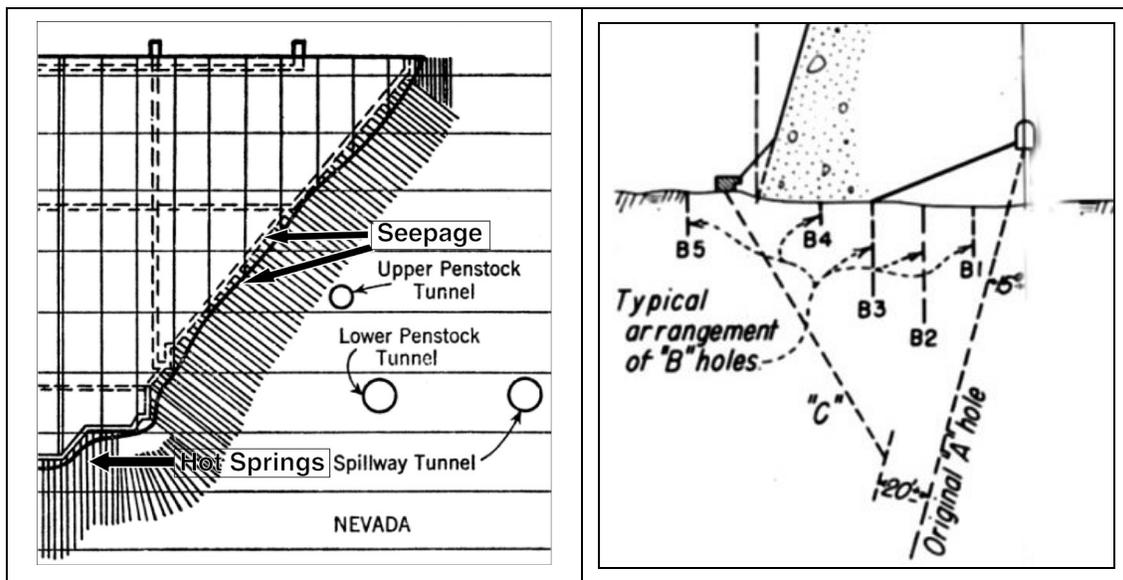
Left diagram shows the original grout holes on the Nevada abutment, the zone of seepage between elevations 840 and 940 ft, and the hot springs near elevation 555 (annotated from Simonds, 1953). Right figure shows the network of grout holes drilled beneath the dam’s upstream heel (McClellan, 1950).
